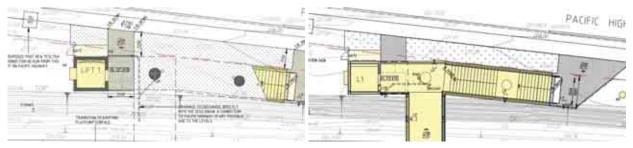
a) LEFT: Lift shaft arrangement at street level, b) RIGHT: Lift shaft arrangement at footbridge level
